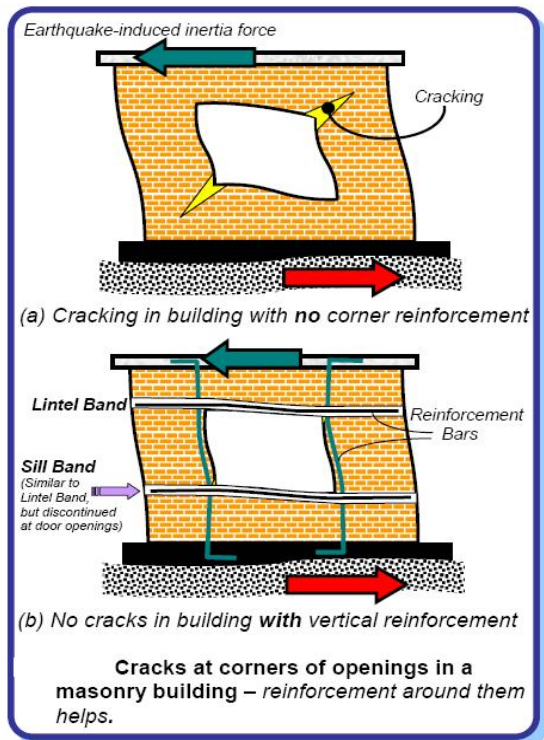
IIT Roorkee provide some tips to prevent the building from Earth quake
